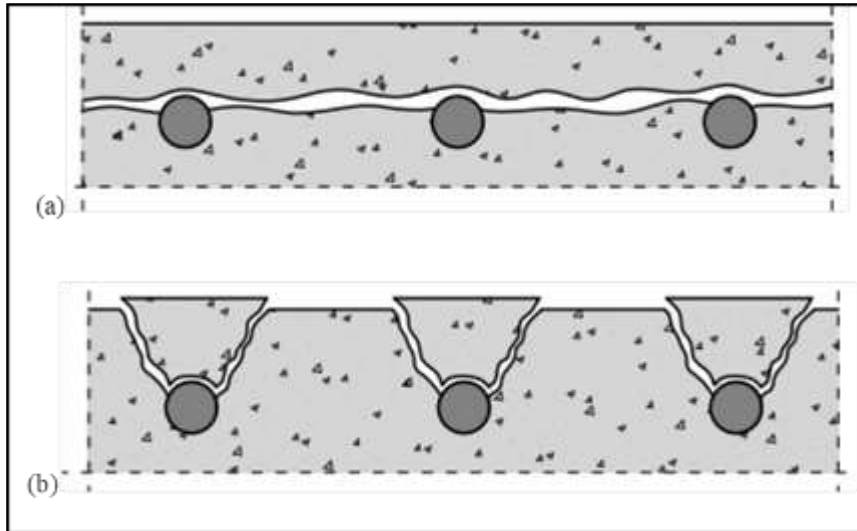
Concrete delamination (a) and spalling (b) [25]
